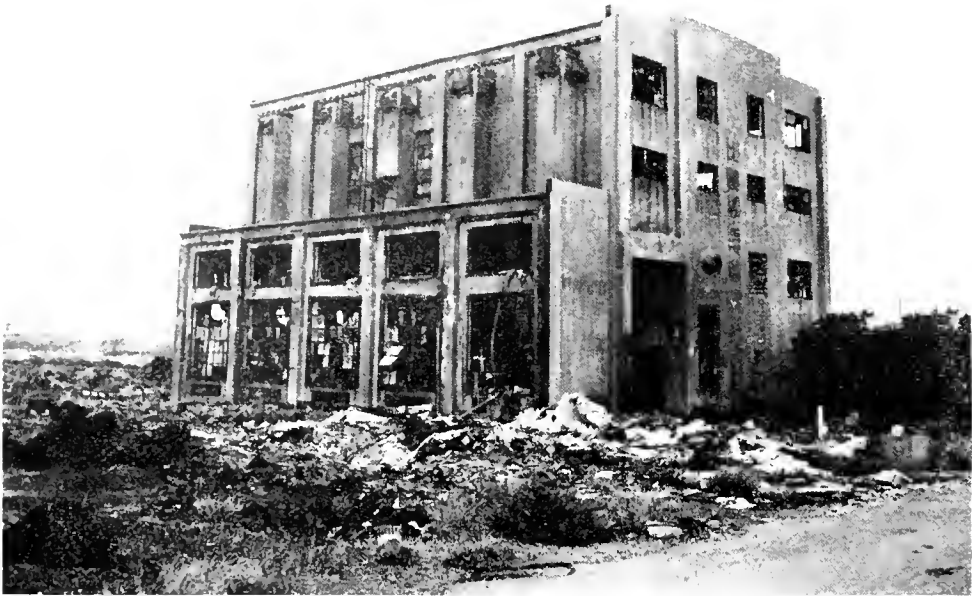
Jukkengawa substation—Front view of building—transformer room in foreground—
